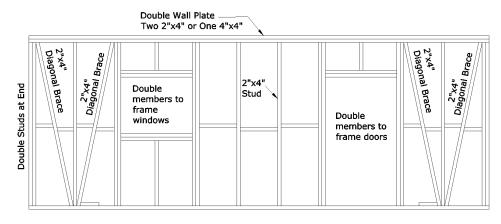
LAYOUT OF WALL TIMBER FRAME
